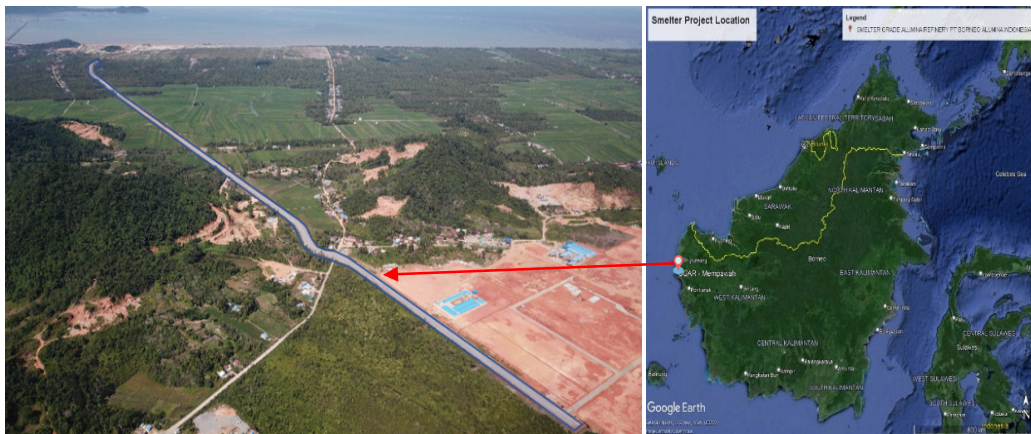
Project location and aerial view road access of smelter project in West Borneo
